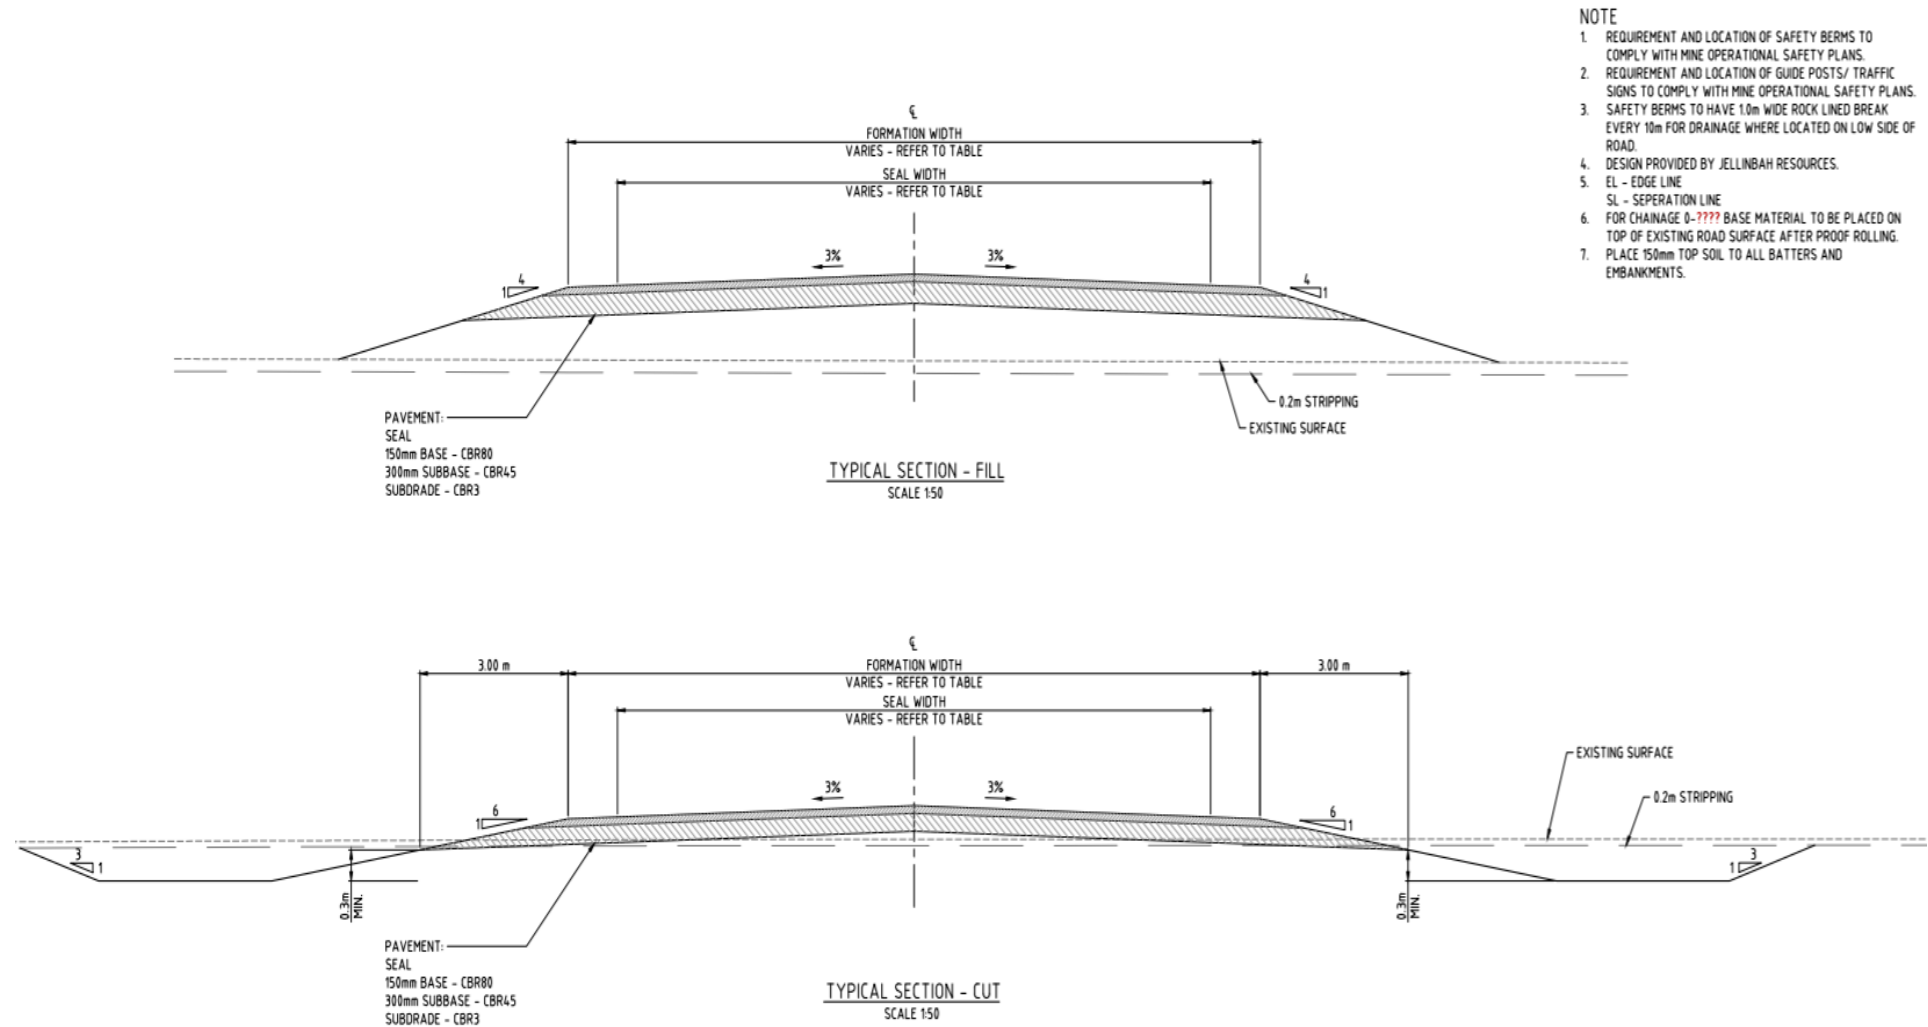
Conceptual cross-sections of the Project access/haulage road
